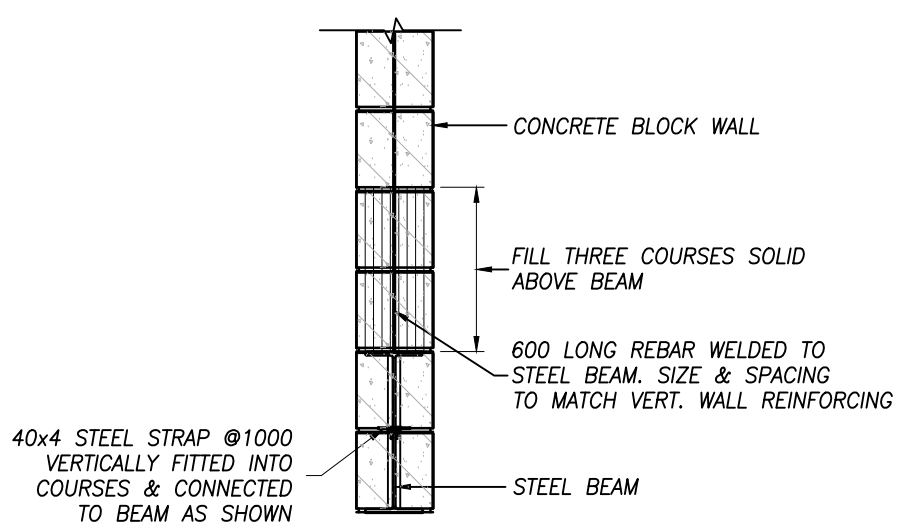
DETAIL OF ANCHORAGE OF STEEL COLUMN TO MASONRY WALL
